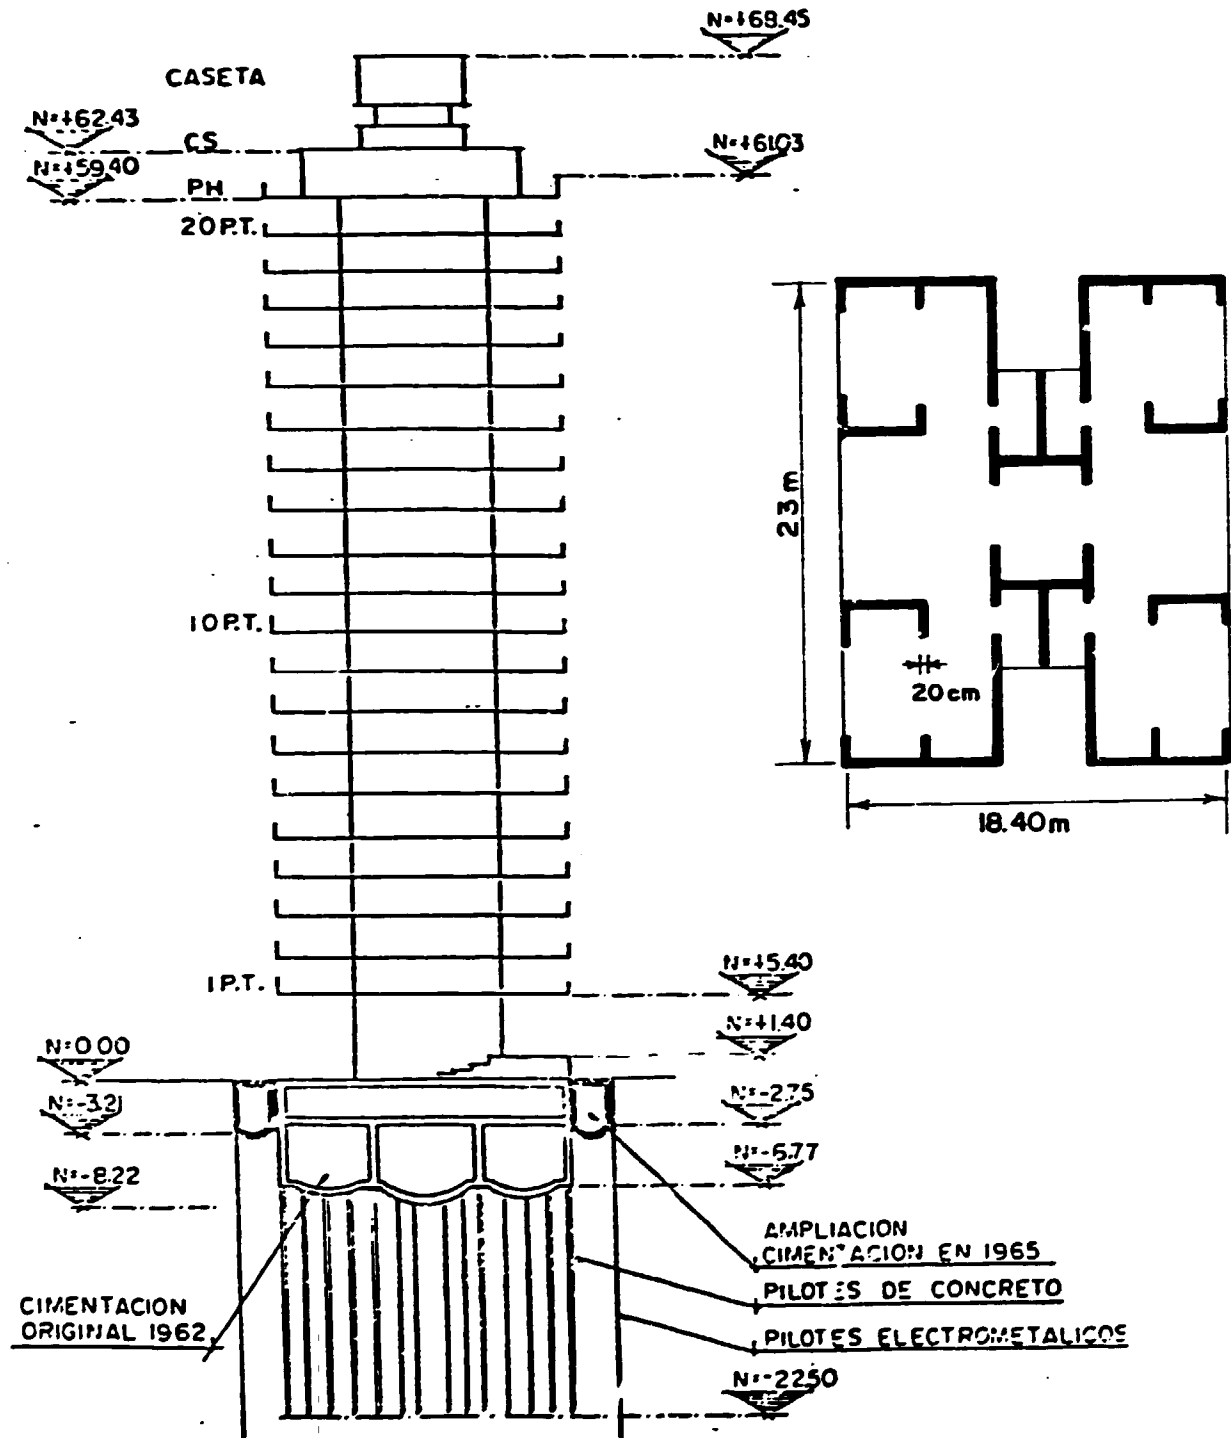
Elevation and a Typical Crosssection for the Building Type-M, Tlatelelco Apartment Complex.
